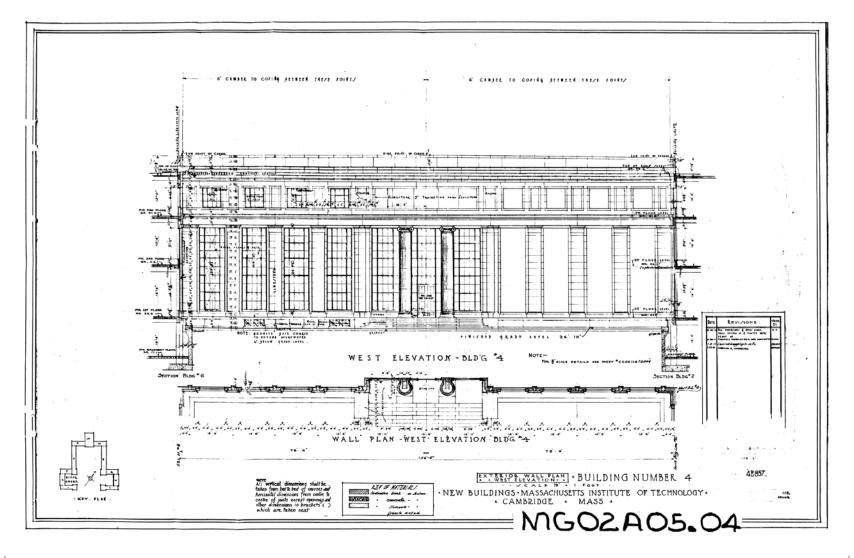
Facade modeled out with columns and pilasters facing the big Court.
